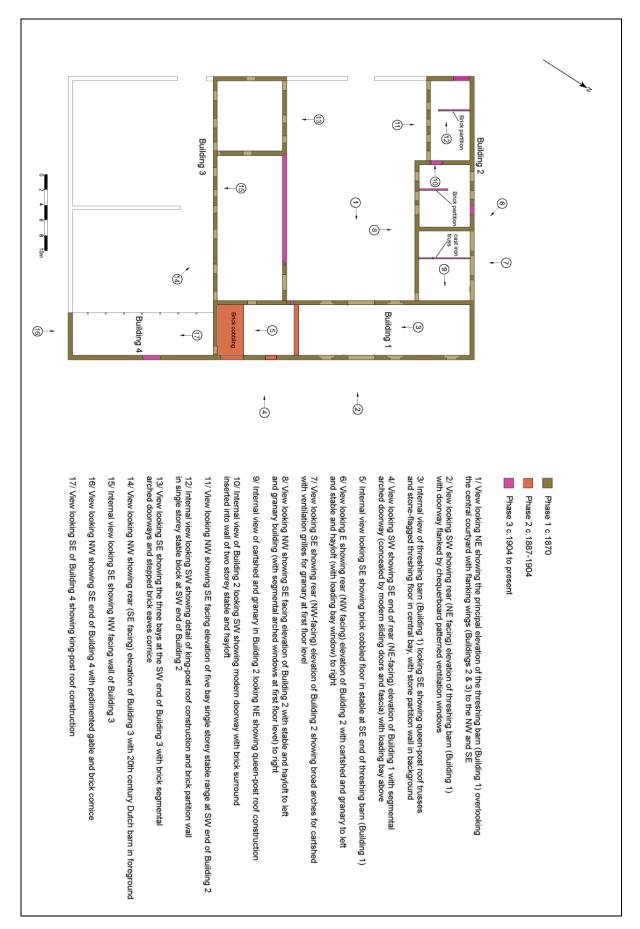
Phased plan of outbuildings at Upper House, Lyonshall
